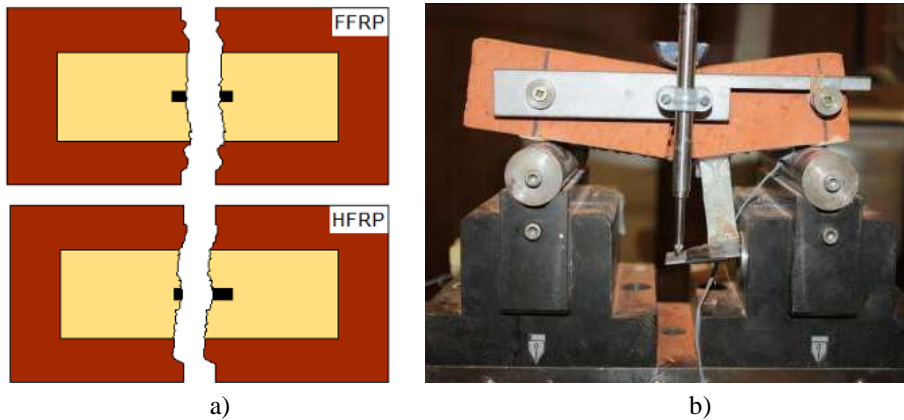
a) Schematic failure modes for TPBT; b) Testing machine.
